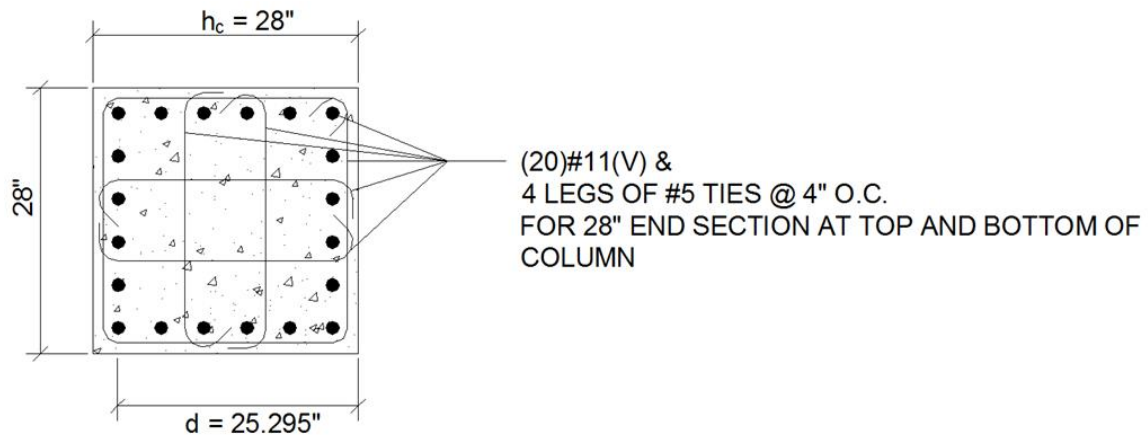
New exterior column cross-section at end section of column at ground floor level based on tsunami design.
